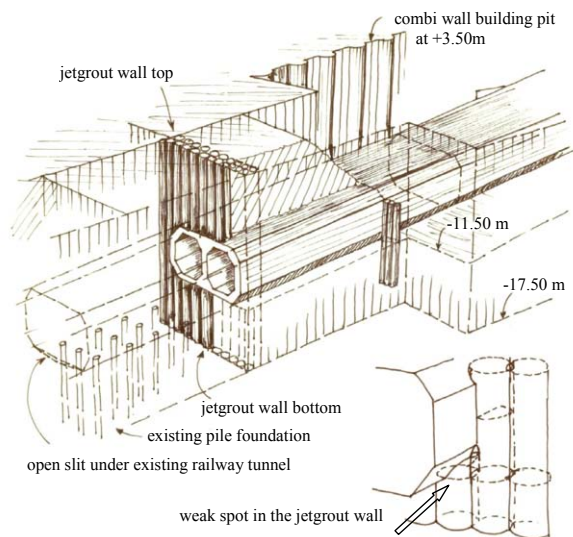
Building pit metro-station Wilhelmina Pier, Rotterdam
